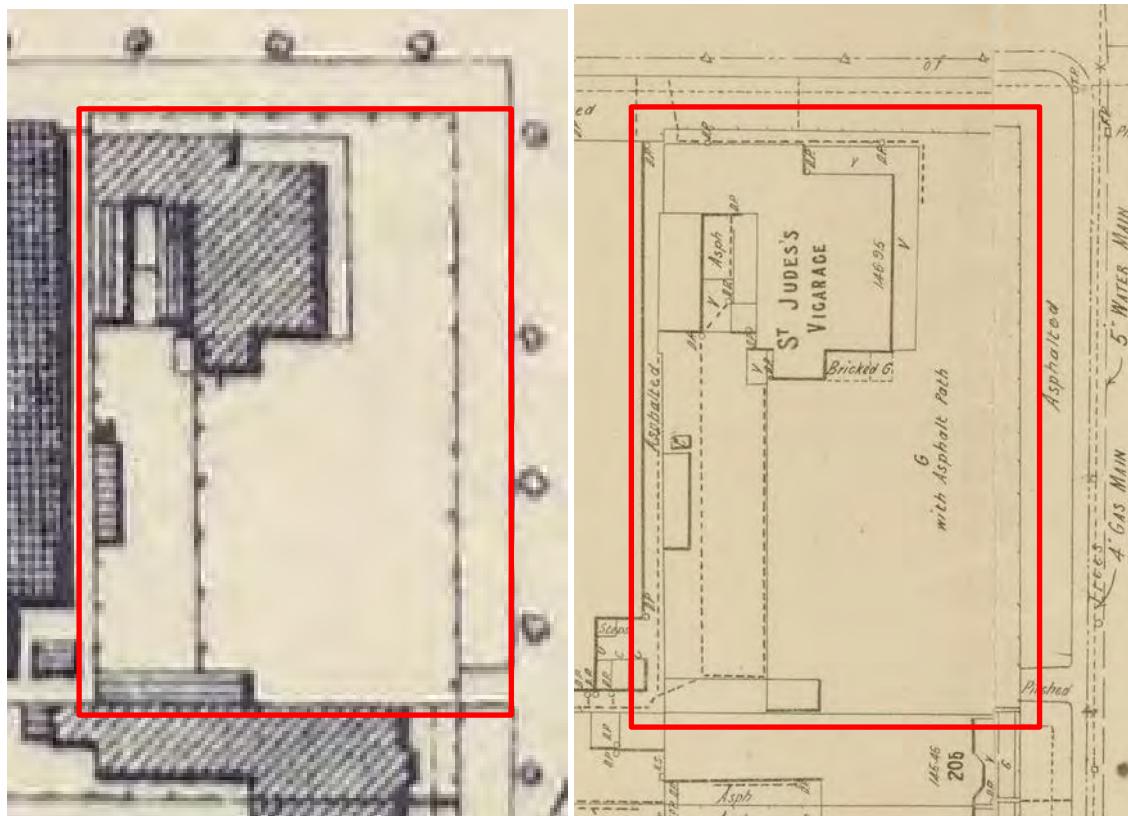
MMBW 160:1 plan no. 30, 1896 (left) and detail plan no. 1184, 1897 (right), showing brick vicarage and other timber buildings on subject site (indicated), 1896. North is at the top of the image, with Drummond Street at right
